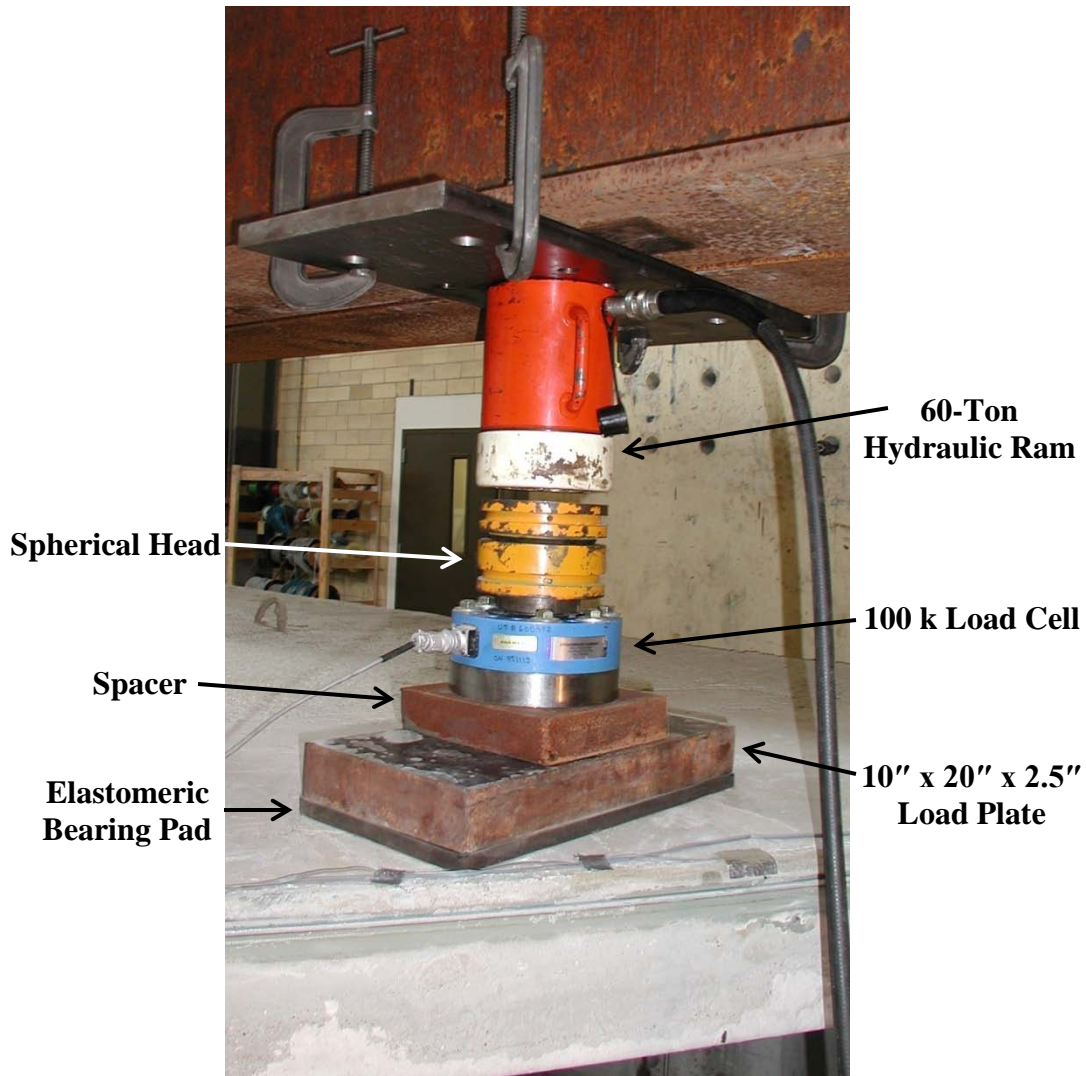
Hydraulic Ram, Load Cell, and Load Plate for Specimen P30P3
